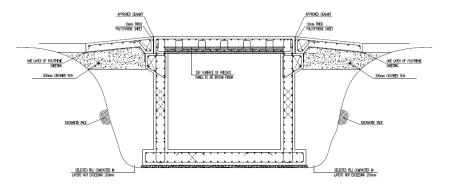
Typical Cross Section of the Bridge (source: JET)
